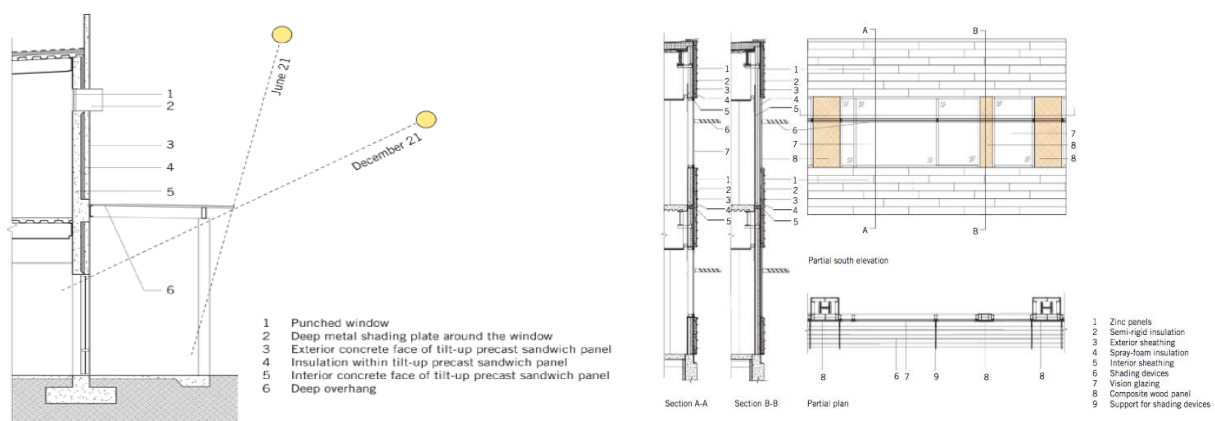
(on the left) Exterior wall section south facade; (on the right) South facade partial elevation, partial plan and sections.
